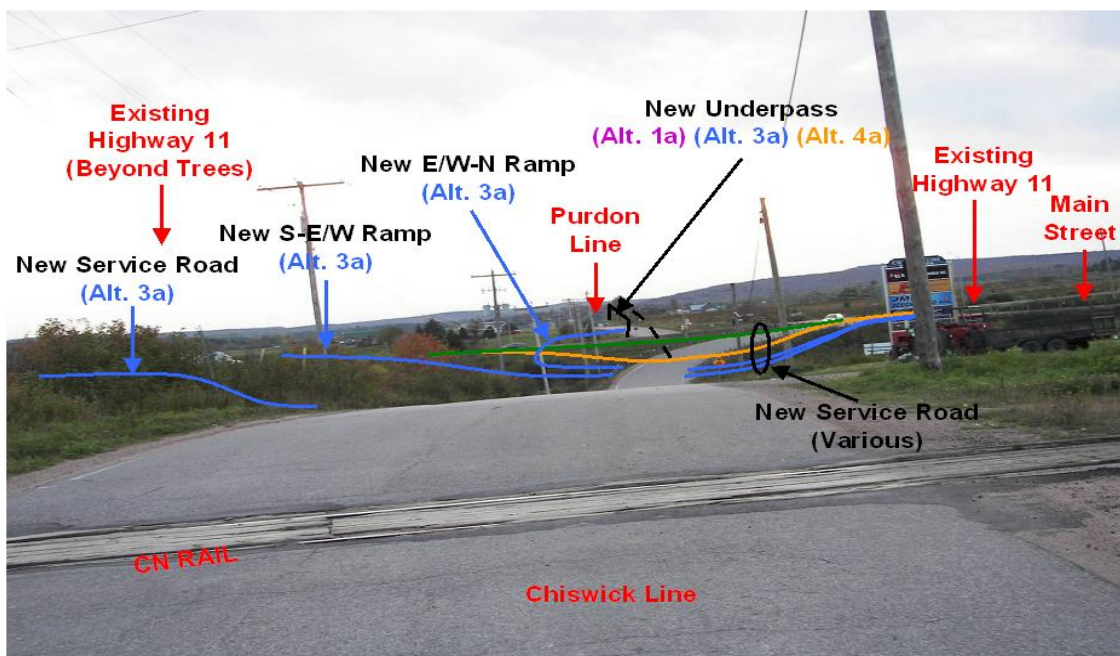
View looking east from driveway of House # 31 Purdon Line at new underpass for alternatives 1a, 3a and 4a. Note underpass to be constructed to the south of the existing intersection. (Oct. 16, 2007)
